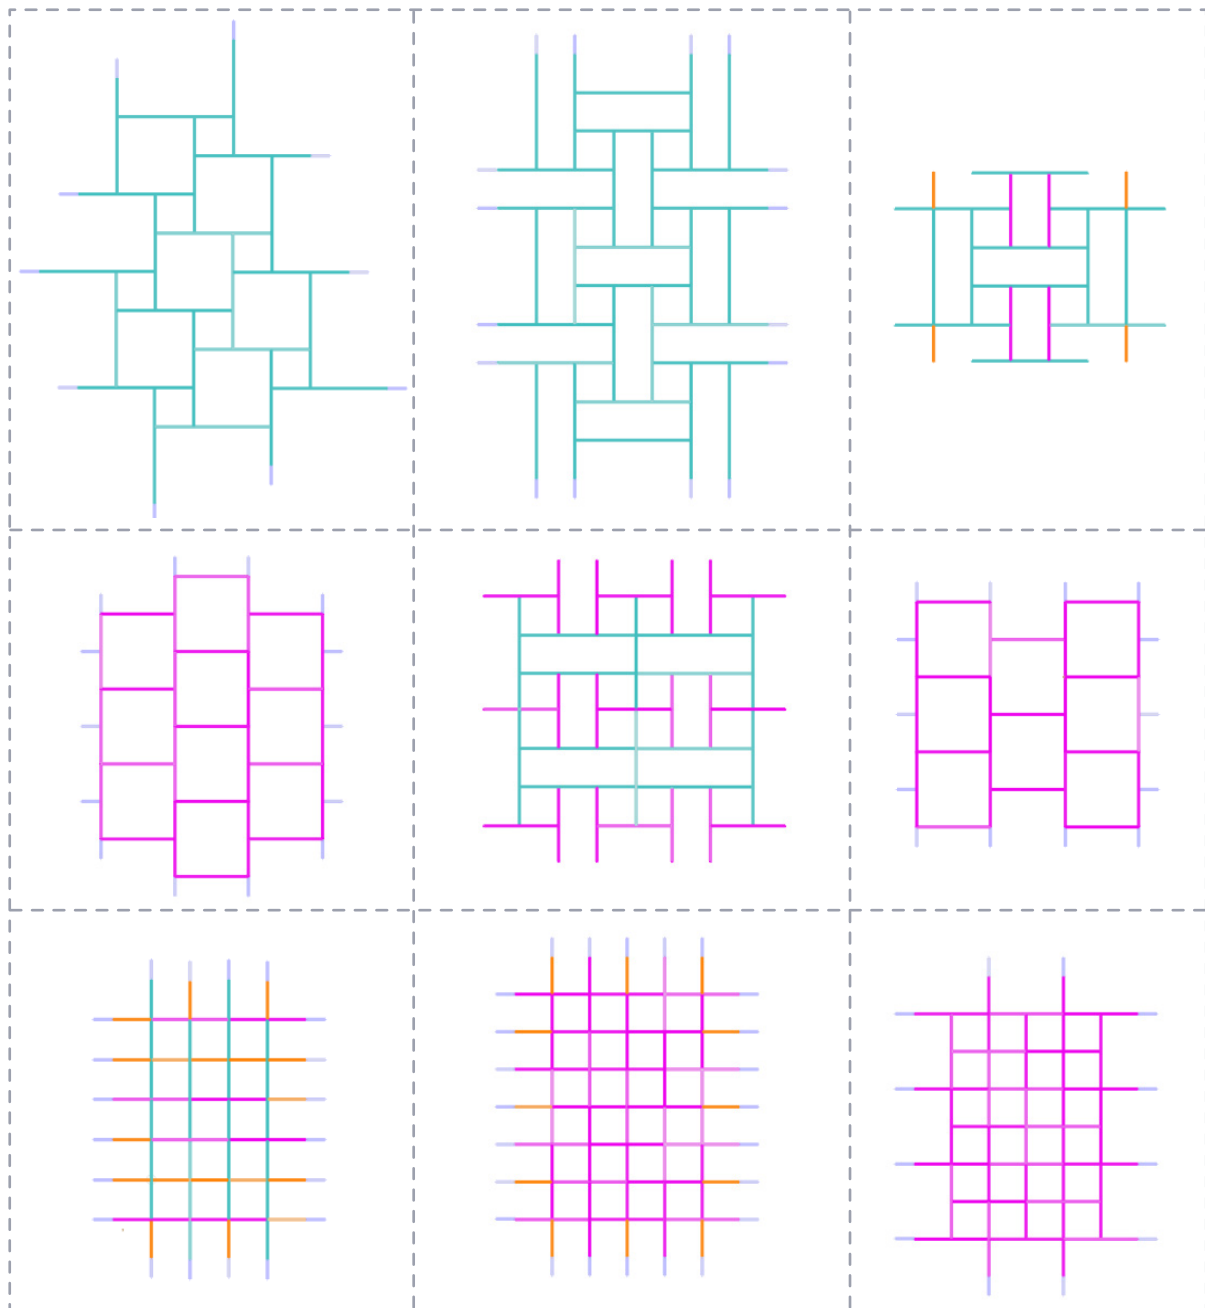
, Reciprocal Roof Structure design sketches , Source: Author's own
